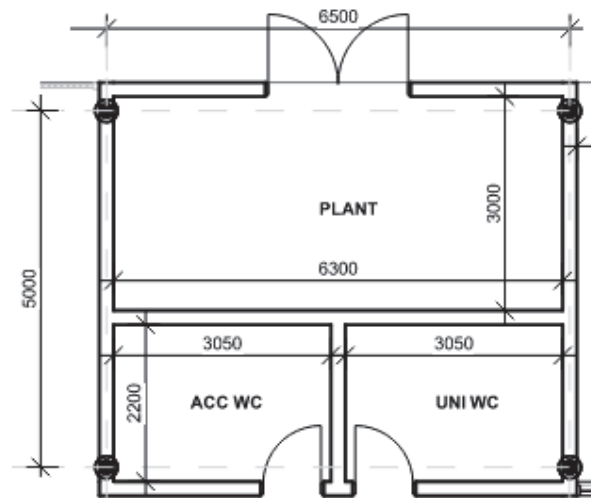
Excerpt Architectural – Plant & Toilet Block
